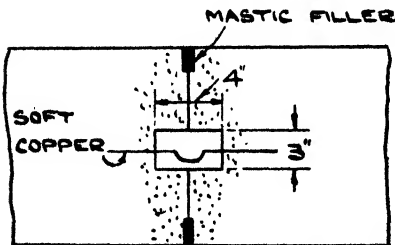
EXPANSION JOINT IN A MASS CONCRETE WALL
